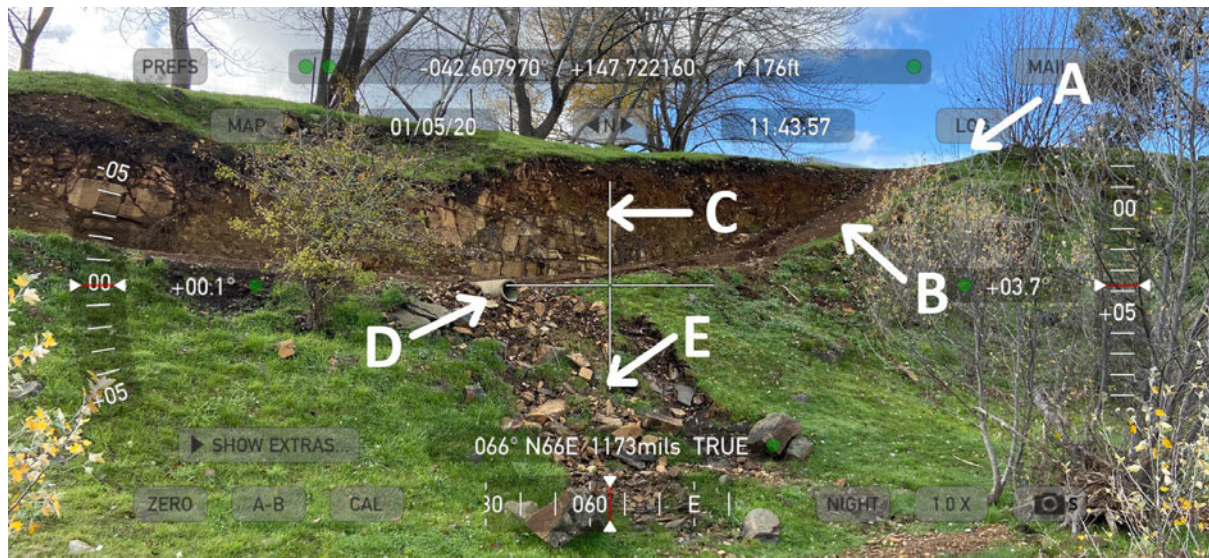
Walking Track works along the southern boundary of lot 60 Kent Street.
